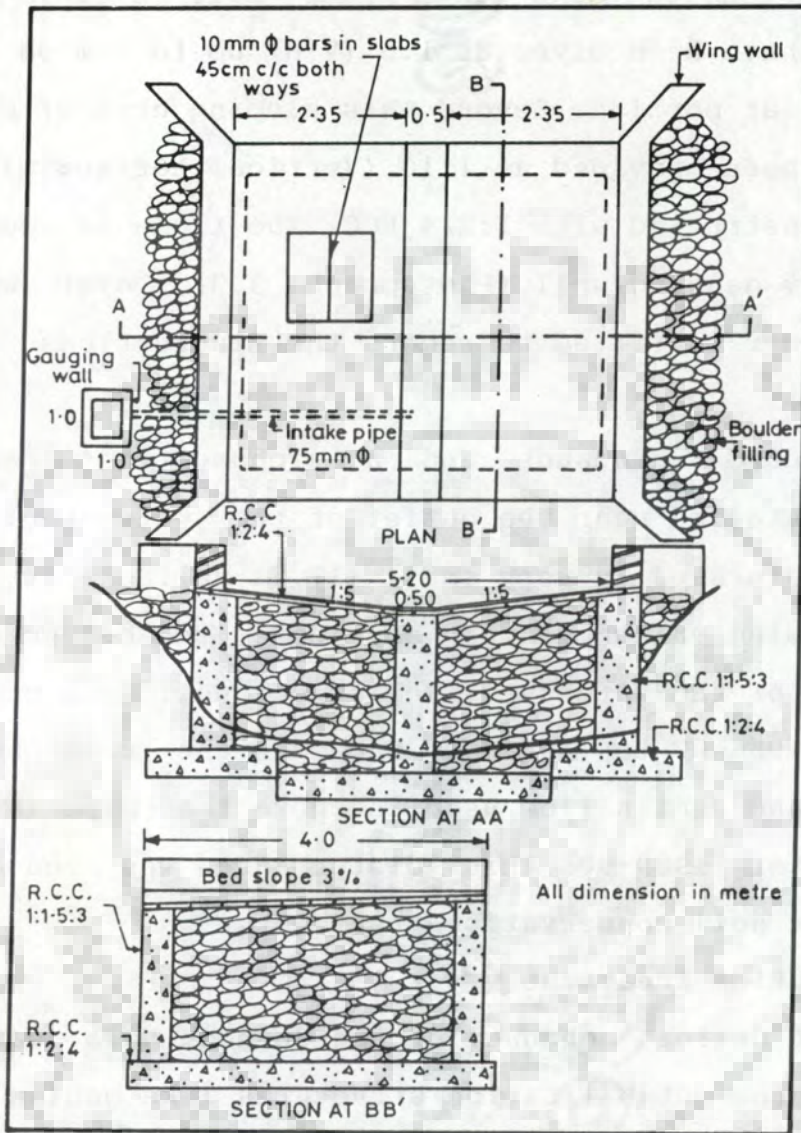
12- R.C.C. TRAPEZOIDAL FLUME CONSTRUCTED AT JHANDOO-NALA (NEAR DEHRADUN) (AFTER JUJAL et al.,1995)
